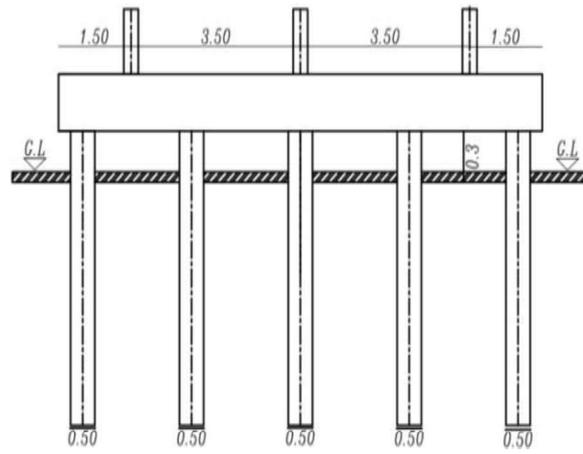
Cross section of piled raft foundation as raft act as slab connected the piles
